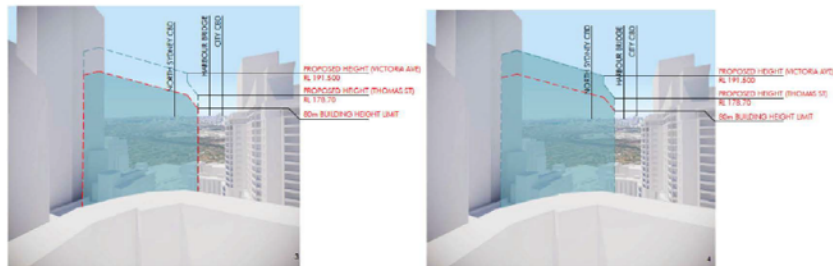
Corridor B - View from top floor of 475 Victoria Ave, Chatswood (Oriented south)
